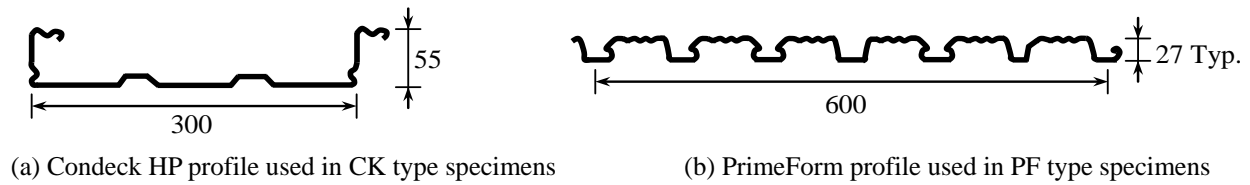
Details of the Condeck HP and PrimForm steel deck profiles
